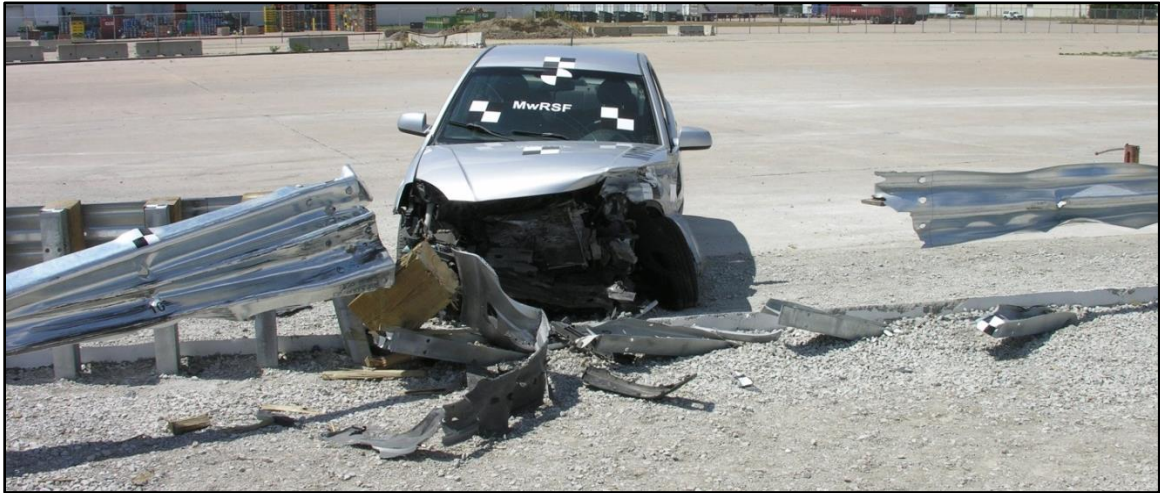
Small Passenger Car and Barrier Damage after Impact into Midwest Guardrail System (MGS) to Thrie Beam Stiffness Transition System [1]
